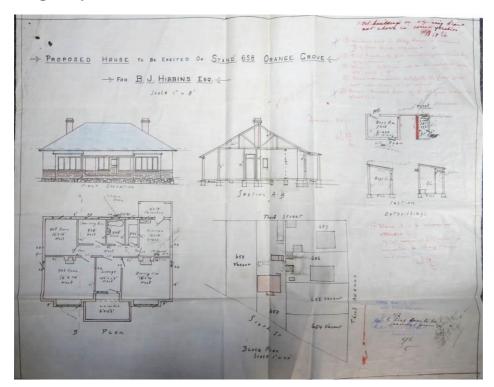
Plan for proposed new houses on Stands 658, Orange Grove from 1924 Good example of two bedroomed single storey residence with corrugated iron roofing and centrally located front stoep
